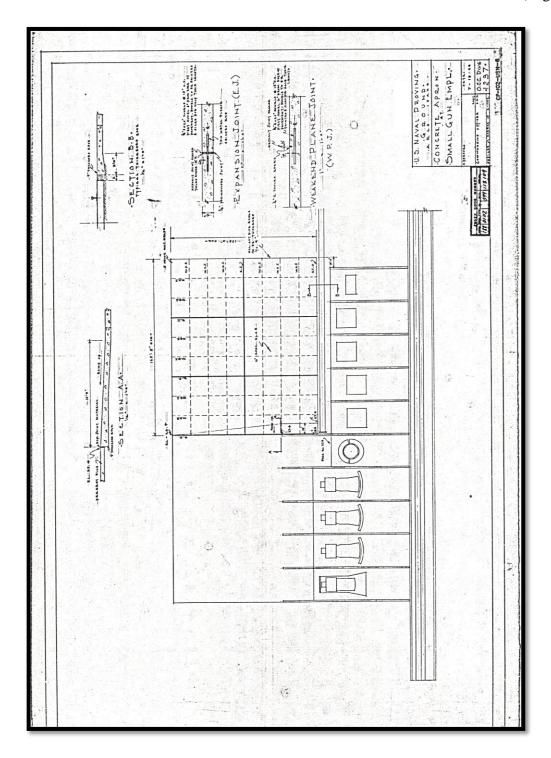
INL drawing number 112109 (CF-102-USN-6); proof / gun emplacement area, concrete apron at small gun emplacement; July 1944.
